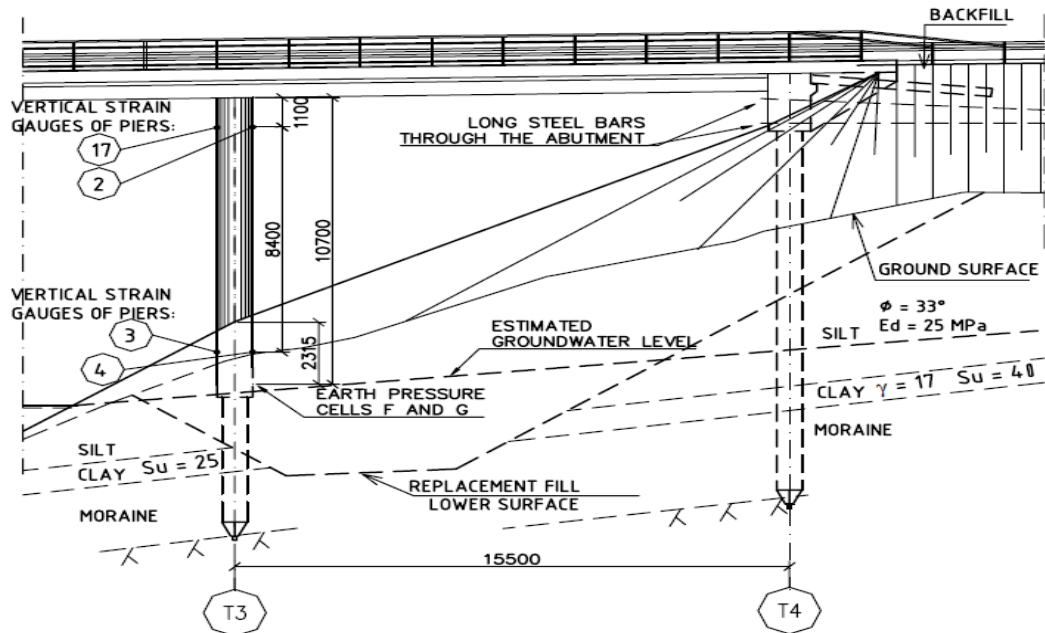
Technical illustration of the bridge deck cross section showing, the eastern abutment and pile (Kerokoski, 2006)
